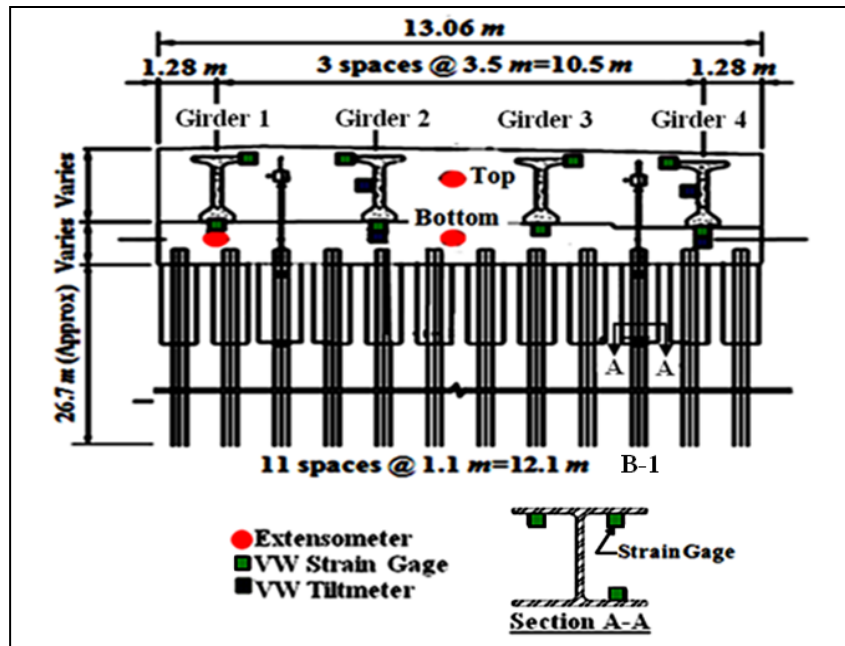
Instrumentation plan of north abutment elevation view [40].
